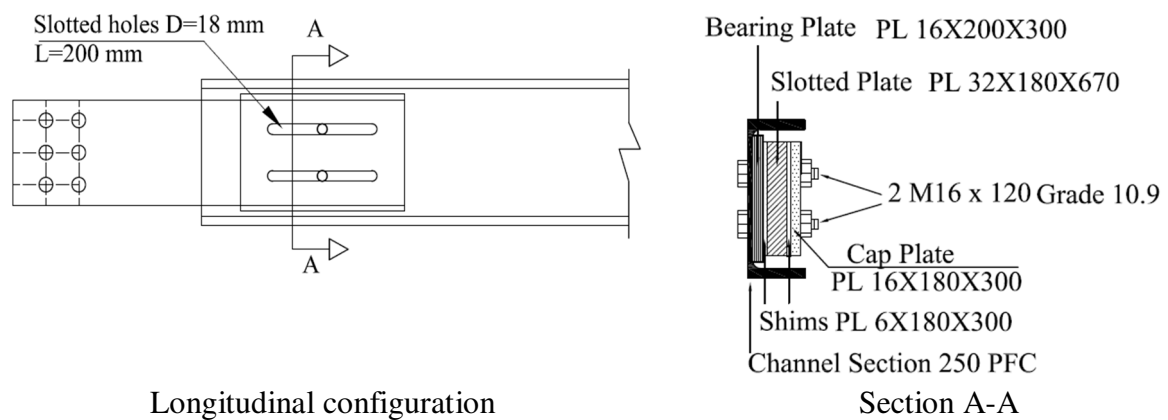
Tested AFC detail. Left is the longitudinal configuration of the specimen, and the section A-A is on right
